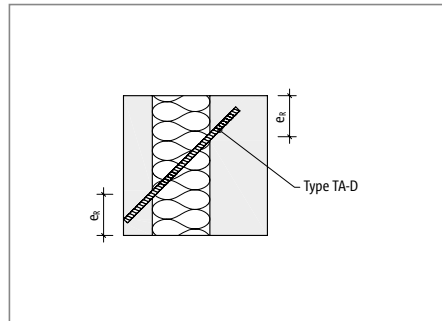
Schöck Isolink® type TA-D: Edge distances  $e_R$  in the wall cross-section
